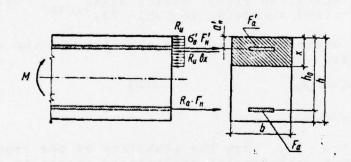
Scheme of the disposition of the compressed zone of concrete and the forces in a prestressed slab of rectangular transverse cross section (when calculating for stability).
